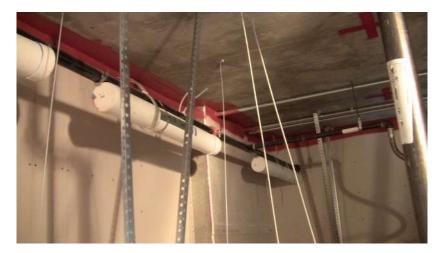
Sand weight on Floor 1 sprinkler pipe in the EL area
